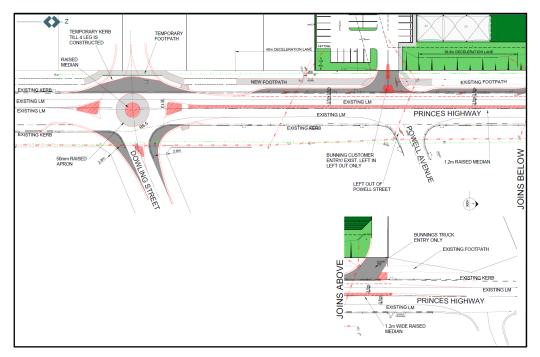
Detailed Concept Plan for Princes Highway VPA roadworks (roundabout, median and associated infrastructure)
